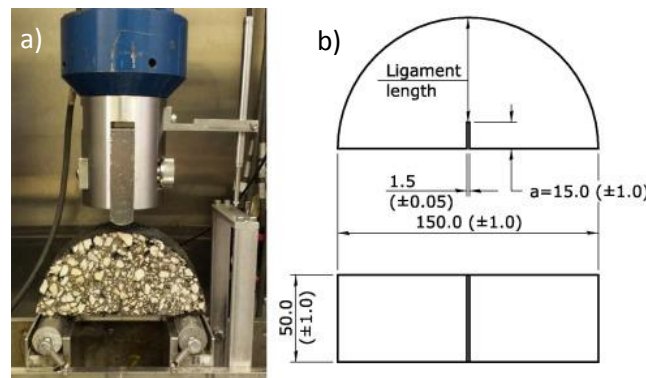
a) SCB test specimen and configuration and b) geometry of specimen (dimensions are in millimeters) [62].
